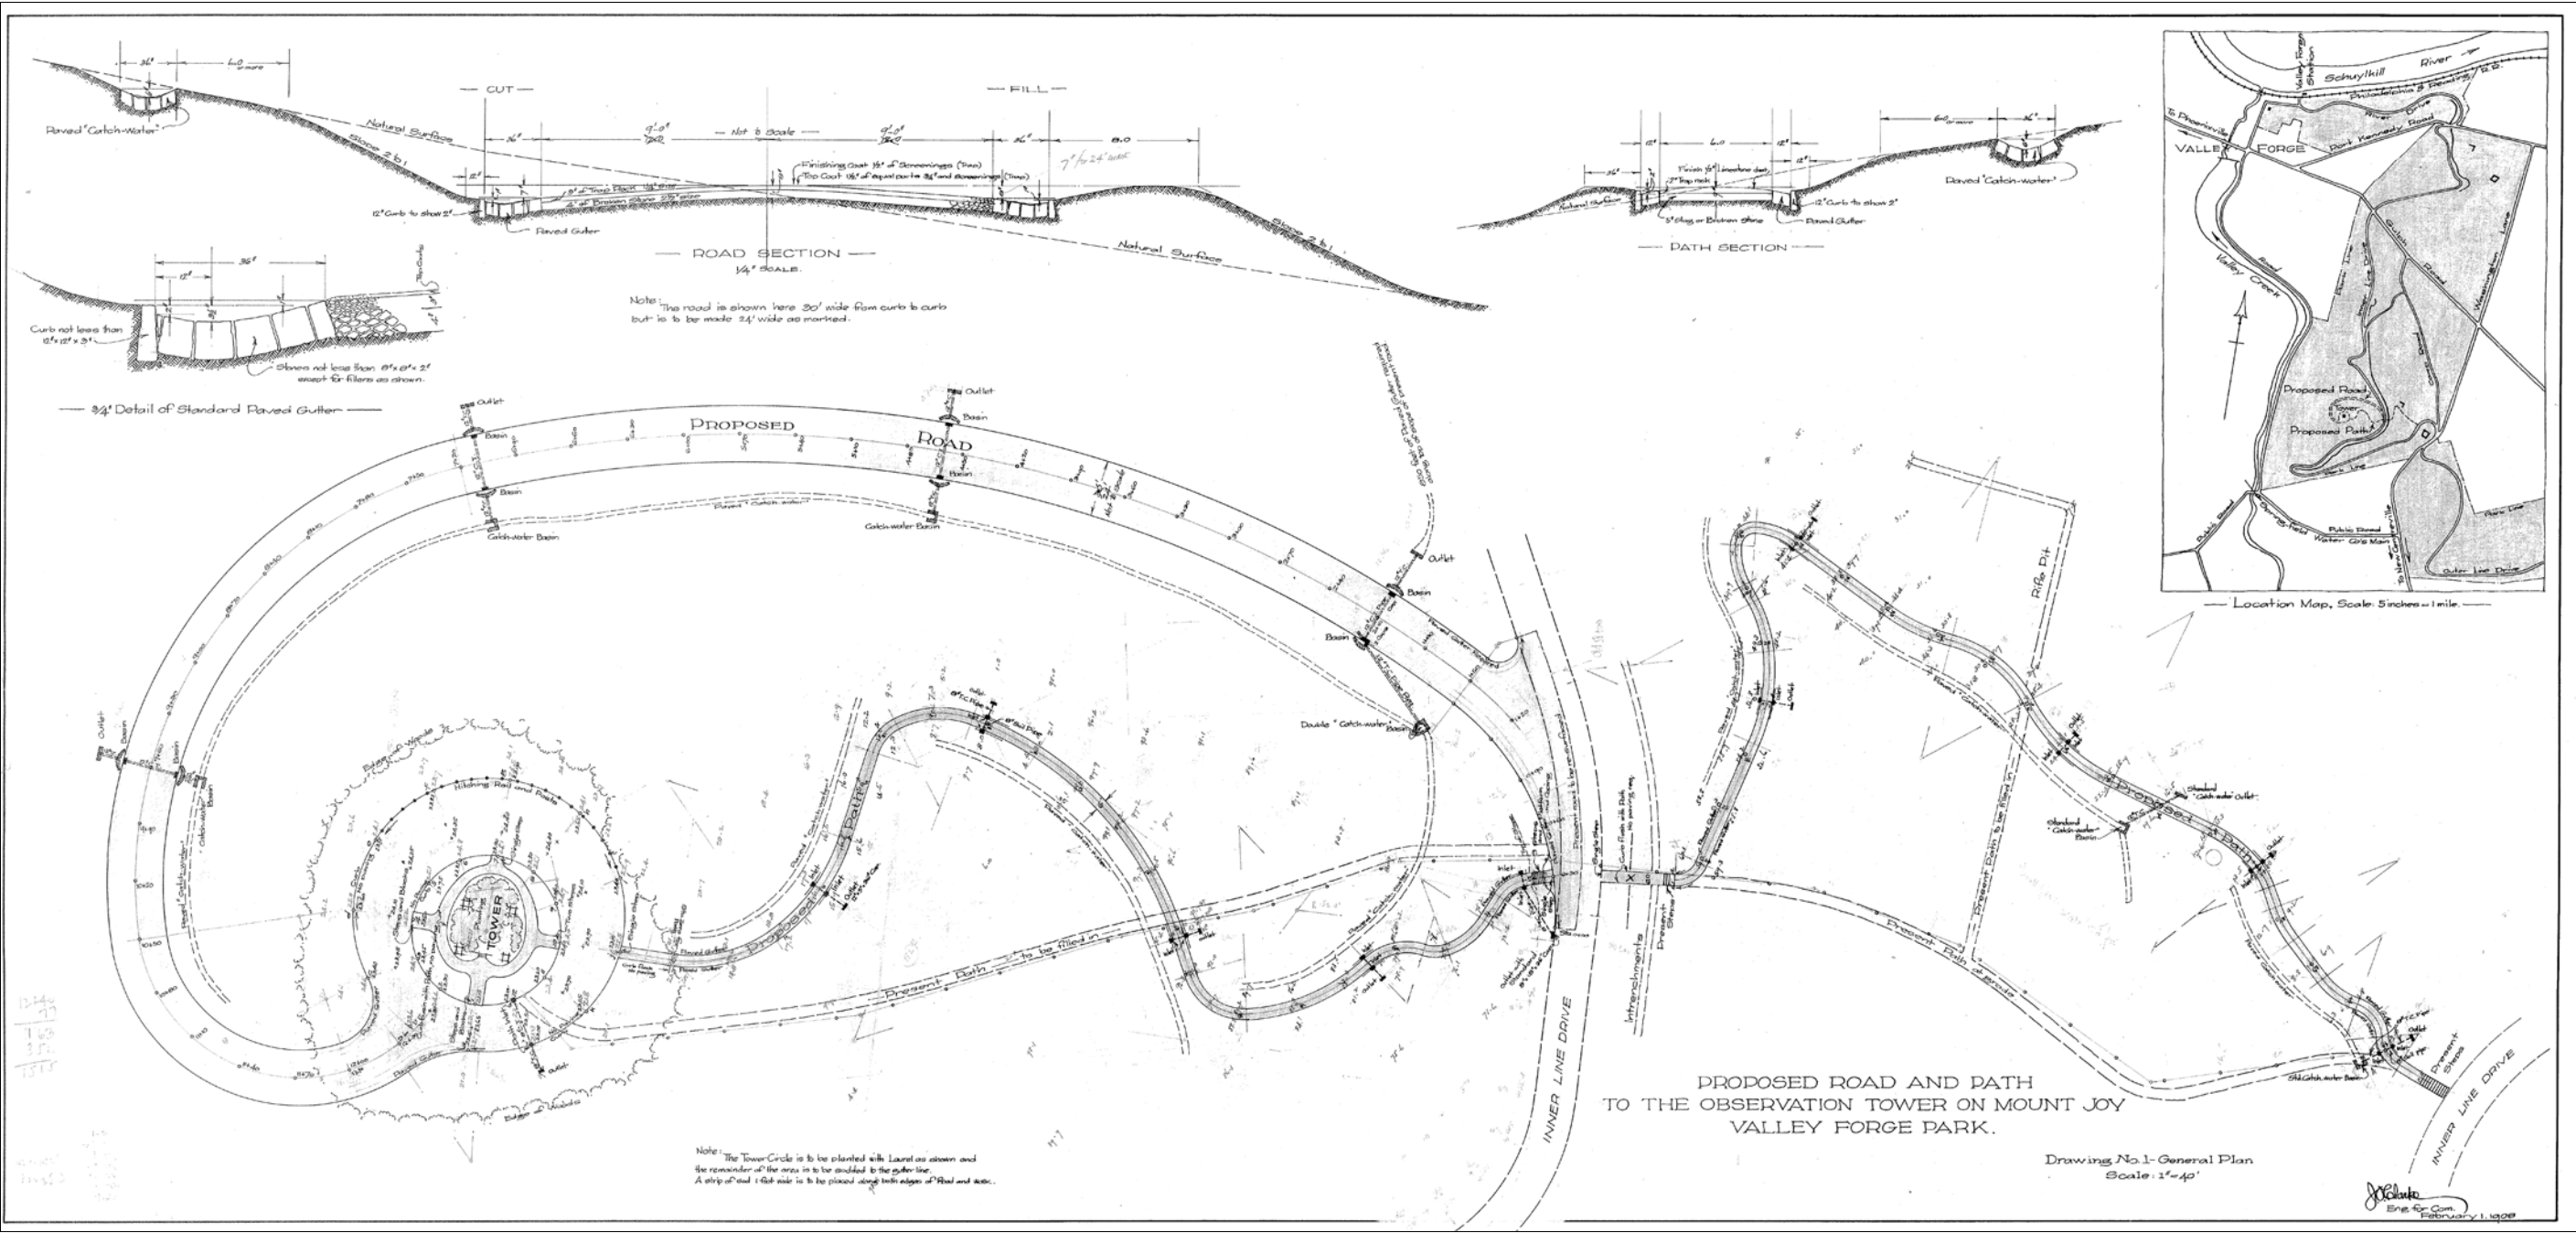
Plan showing *Proposed Road and Path to the Observation Tower on Mount Joy*, Drawing No. 1, General Plan. Drawn by J. O. Clarke, February 1, 1908 (VAFO Archives).
